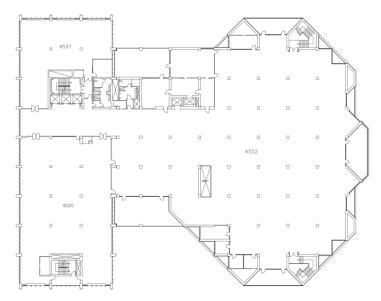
Roof of UCSB Library, top of fourth floor.
